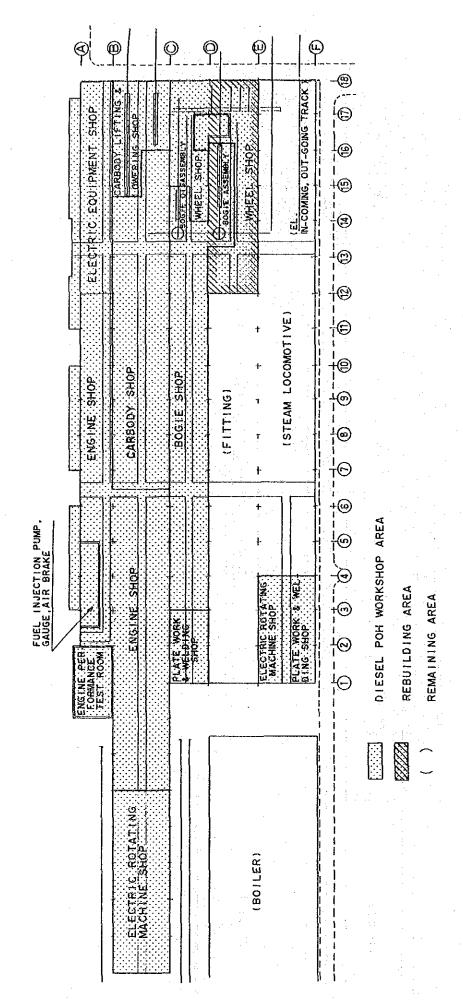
Workshop Layout Plan (Plan 3)
